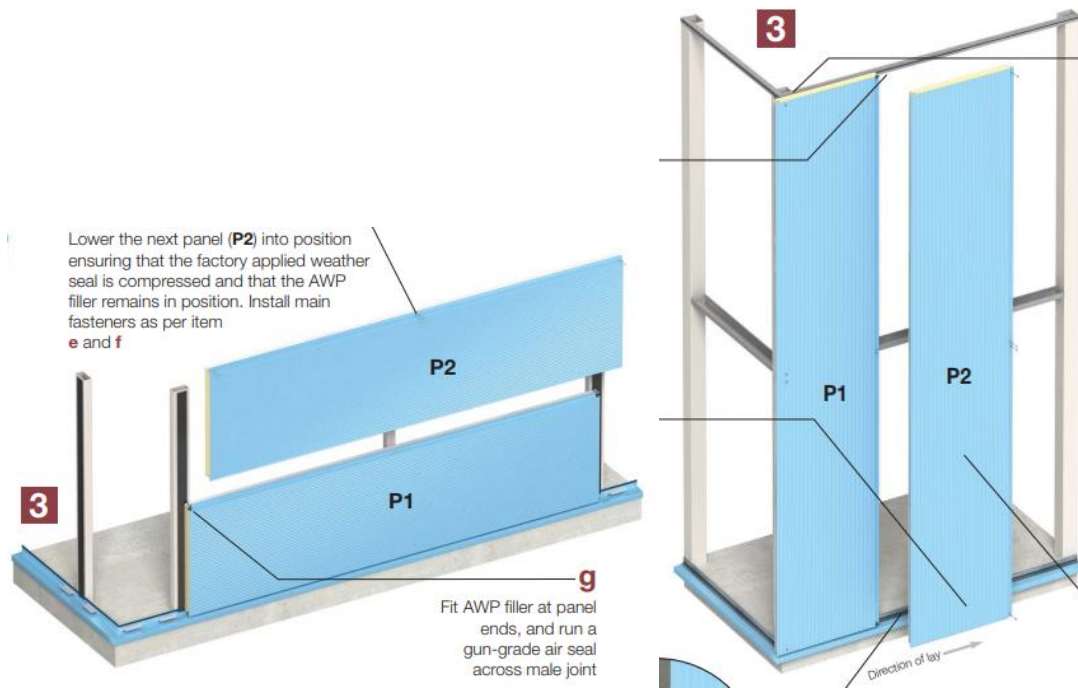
ISP panels installed horizontally or vertically (from Kingspan external wall system installation guide<sup>[29]</sup>)
